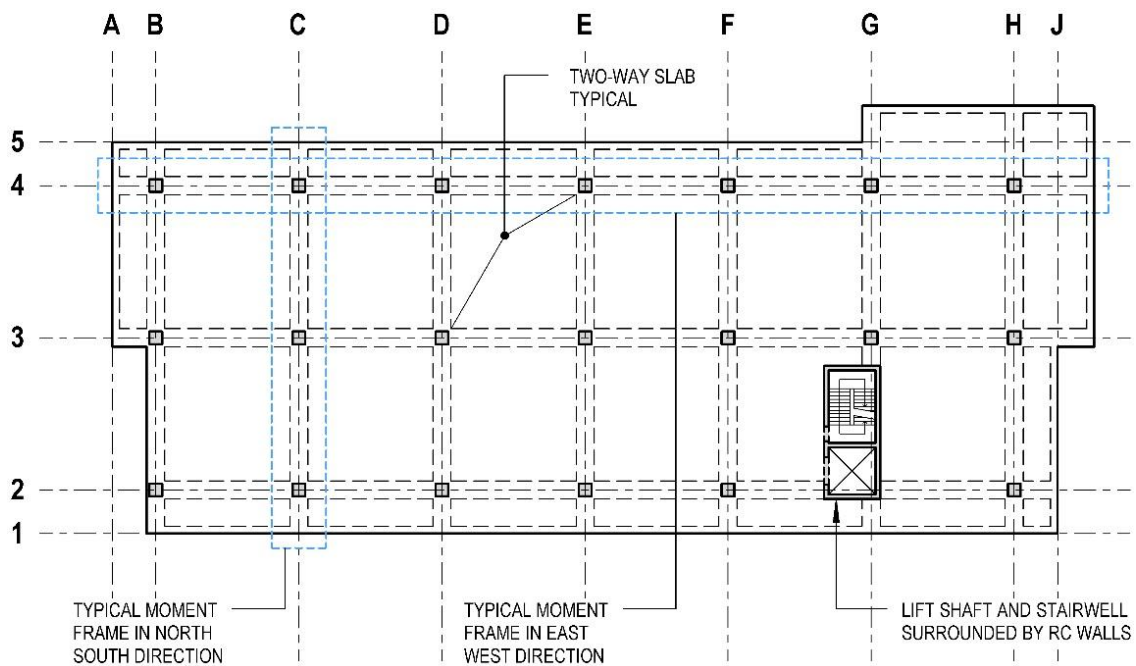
Category 3 building with dual RC moment resisting frame and RC walls.
